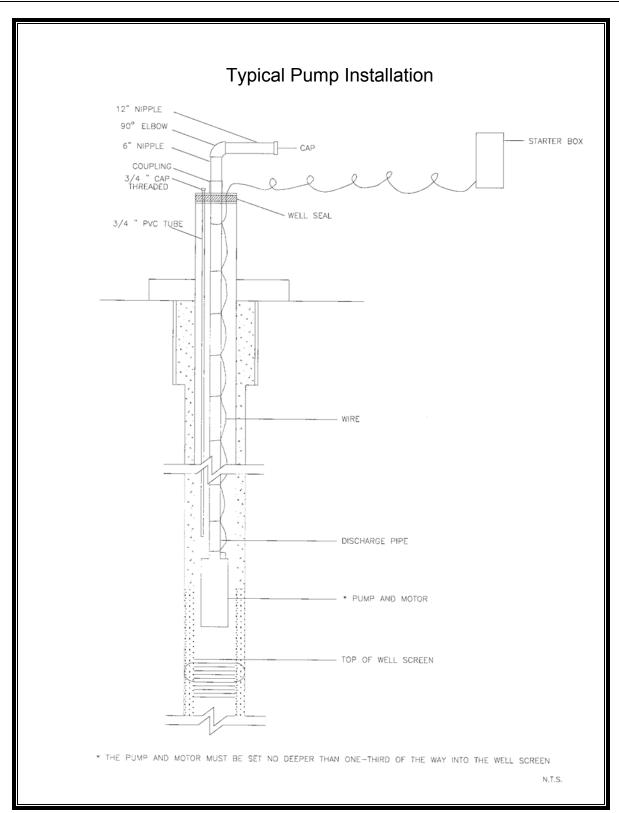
18 Installation of Submersible Pump with Above Ground Discharge
